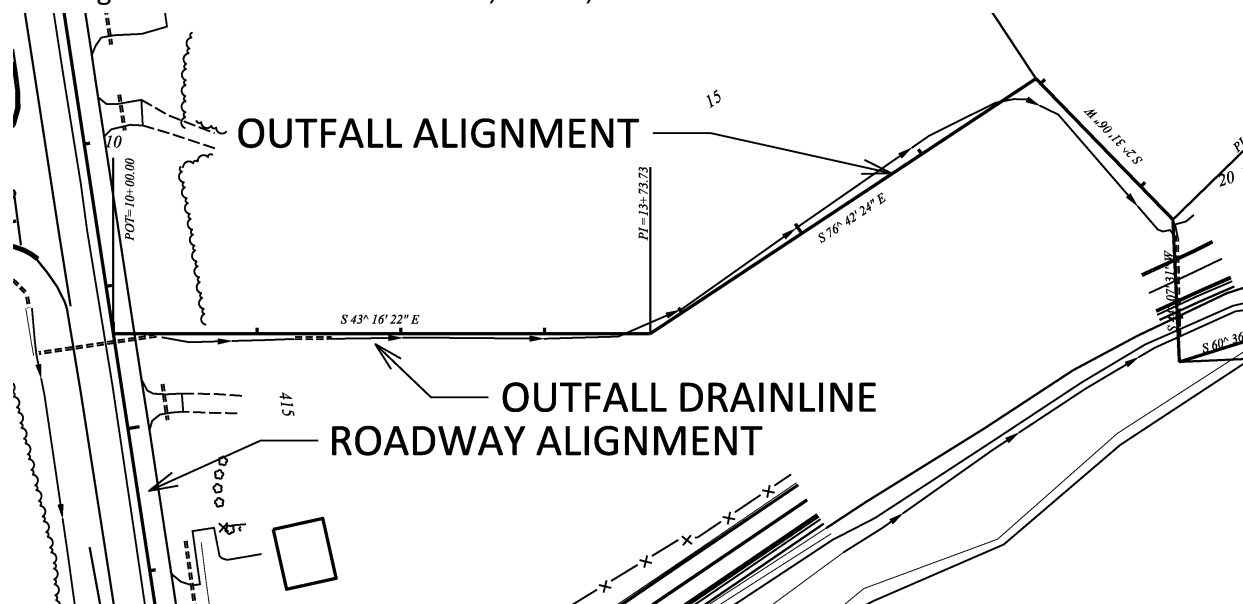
OUTFALL DRAINAGE ALIGNMENT
